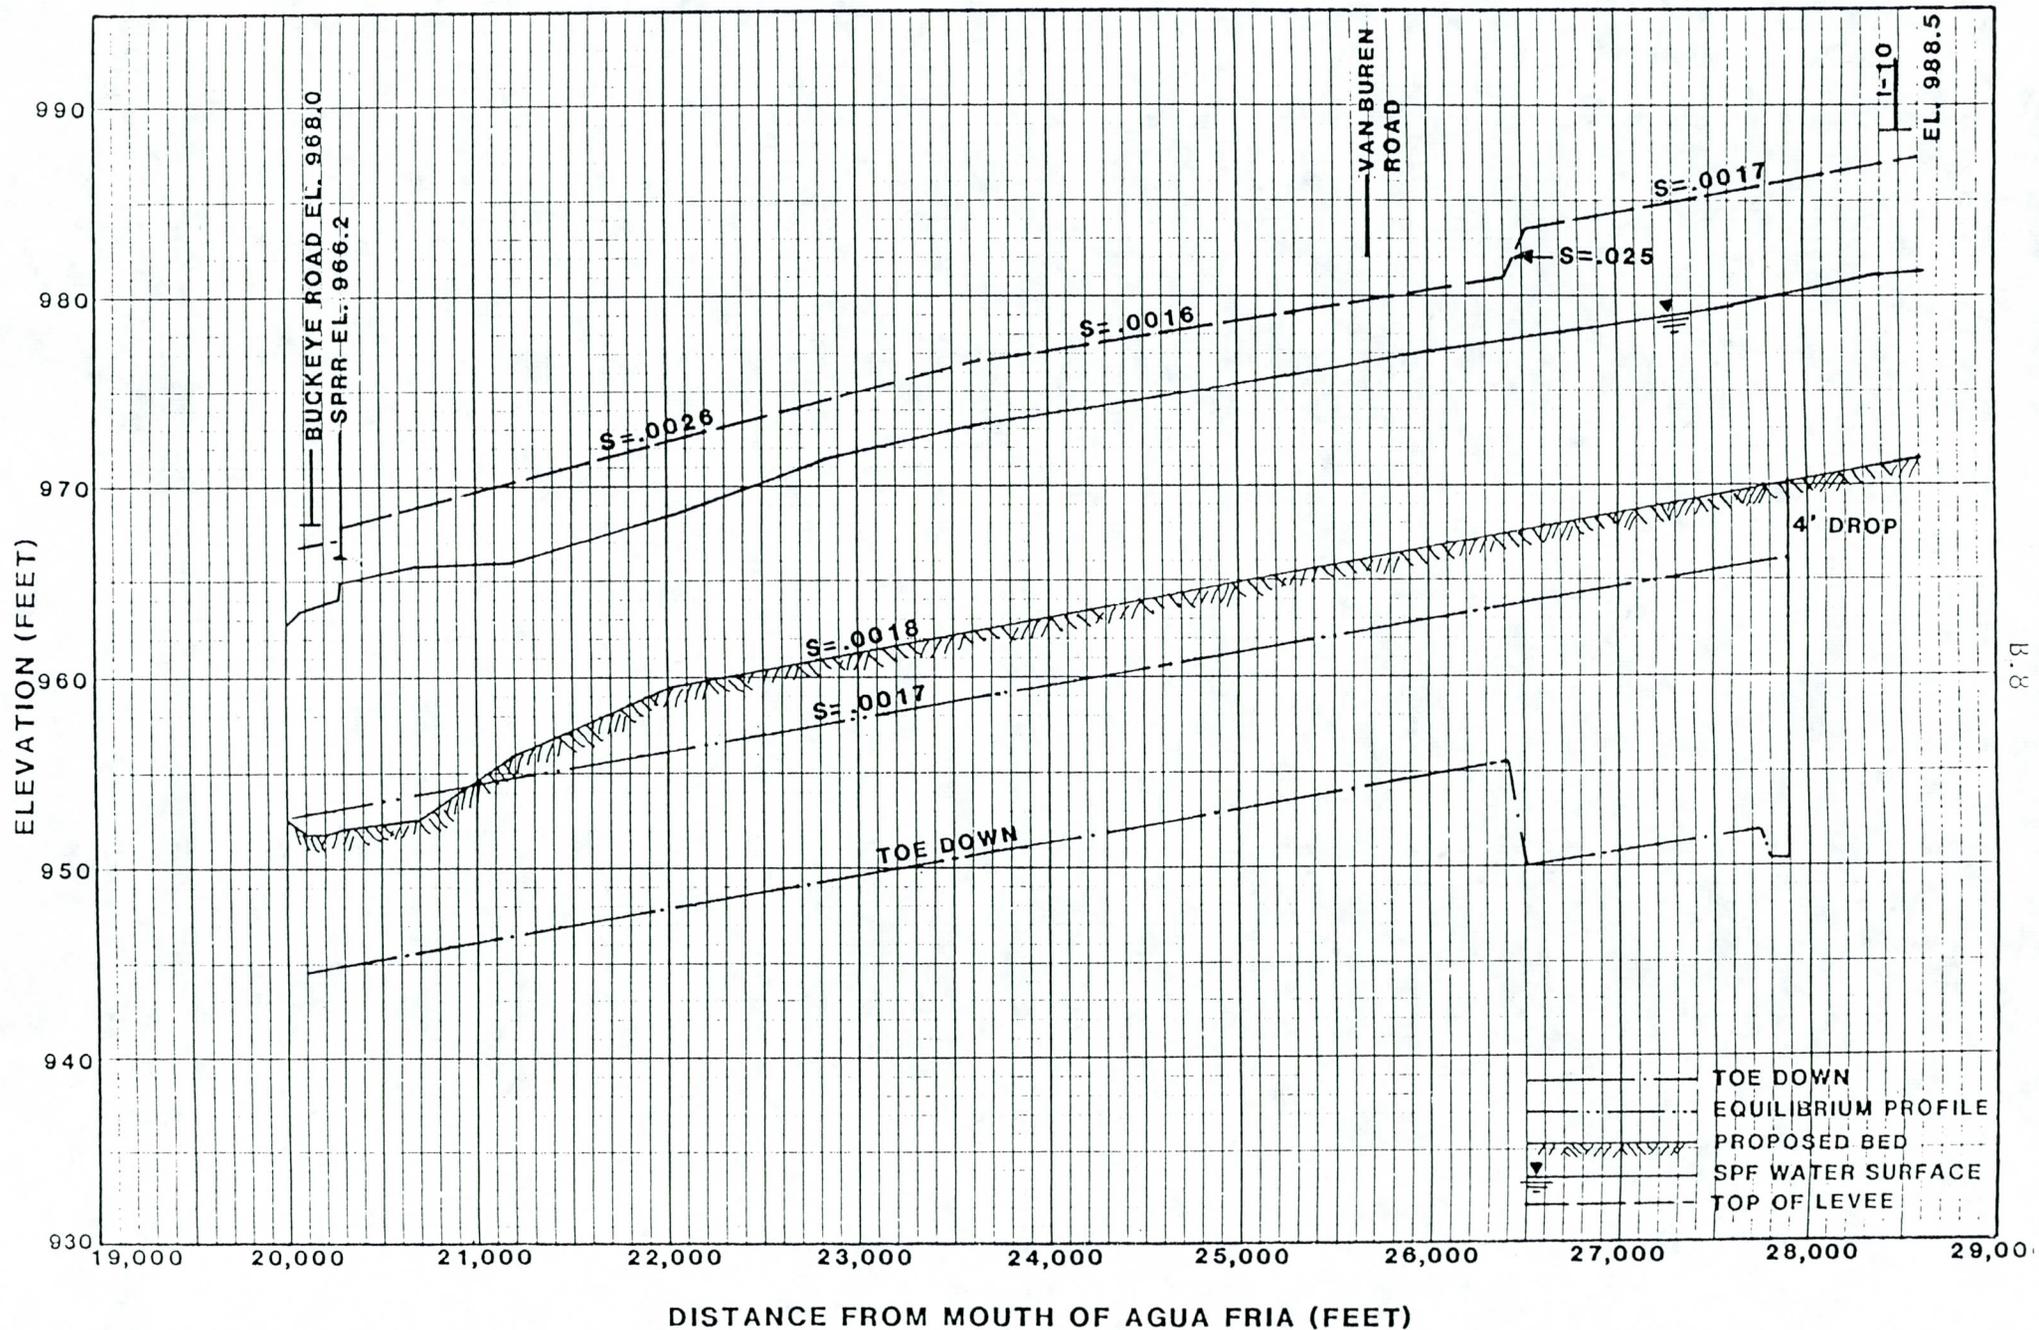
Proposed bed profile, equilibrium bed profile, SPF water-surface elevation, levee height and toe-down depth between Buckeye Road and I-10 for the west bank.
